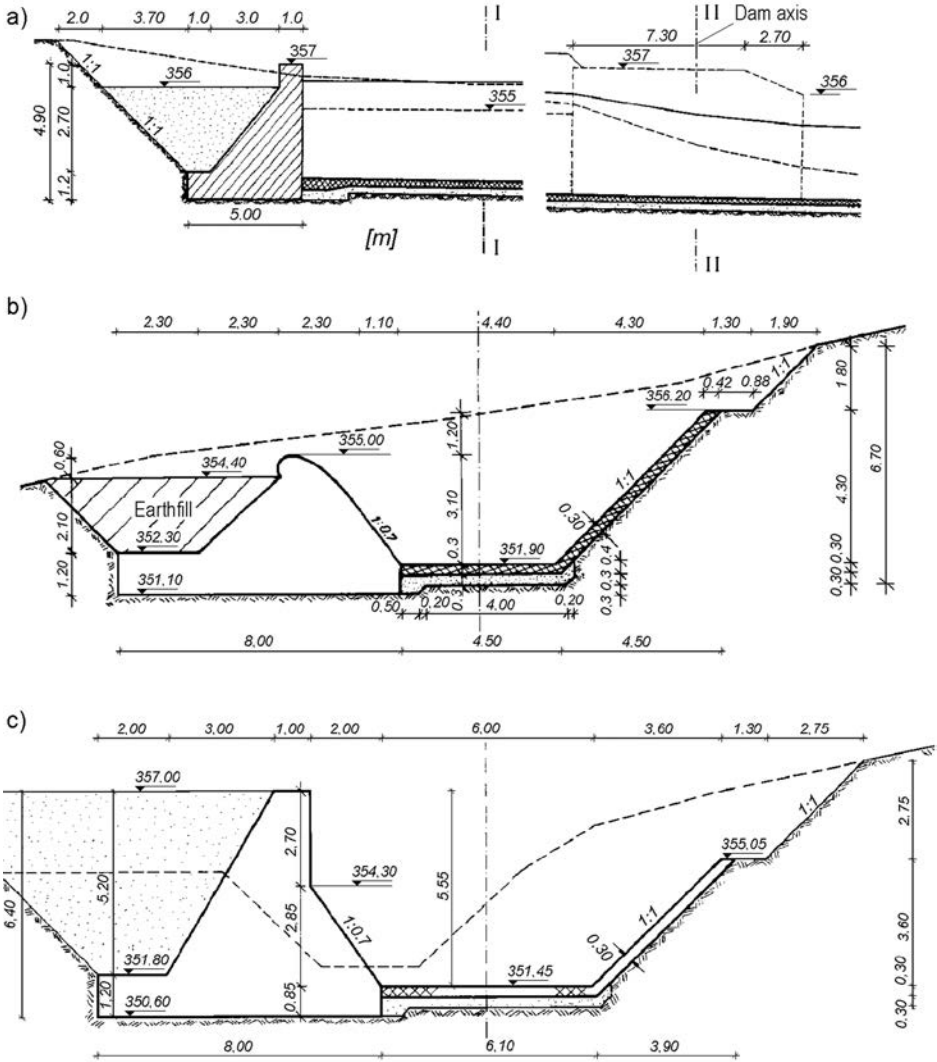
Longitudinal section through the collecting and initial part of the outlet channel. (a) and cross-sections I-I and II-II (b and c), in a side-channel spillway structure on soil foundation.
